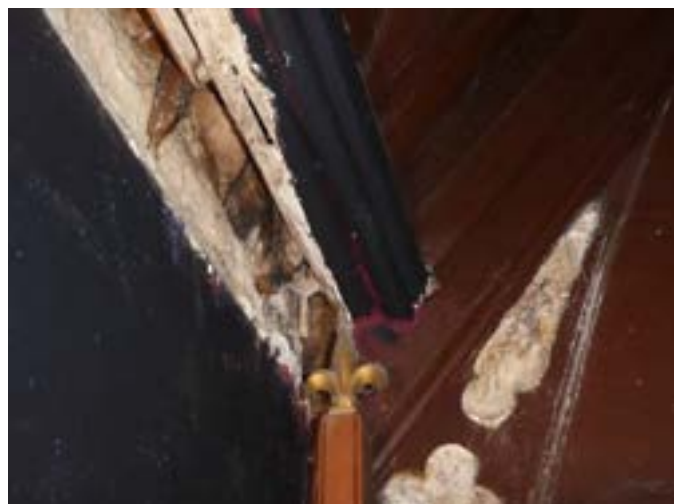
Showing typical painted timber rafter detail within the main theatre.
